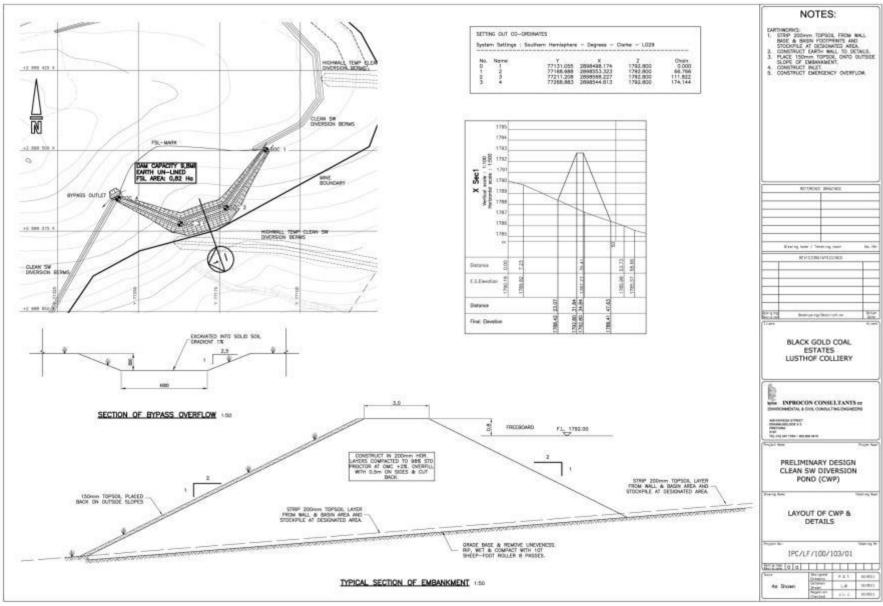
(a): Clean Water Diversion Pond - Layout and Details.
